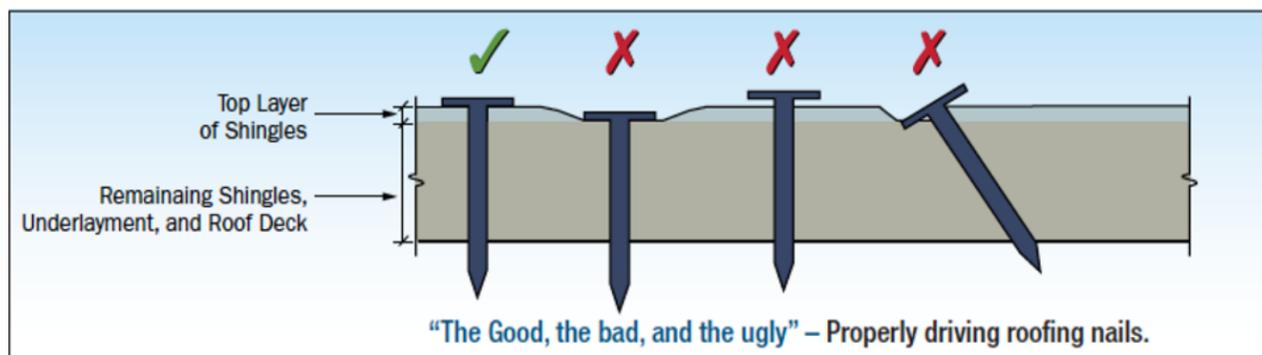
Example of how to properly drive roofing nails when nailing shingles, underlayment, and the roof deck together.
